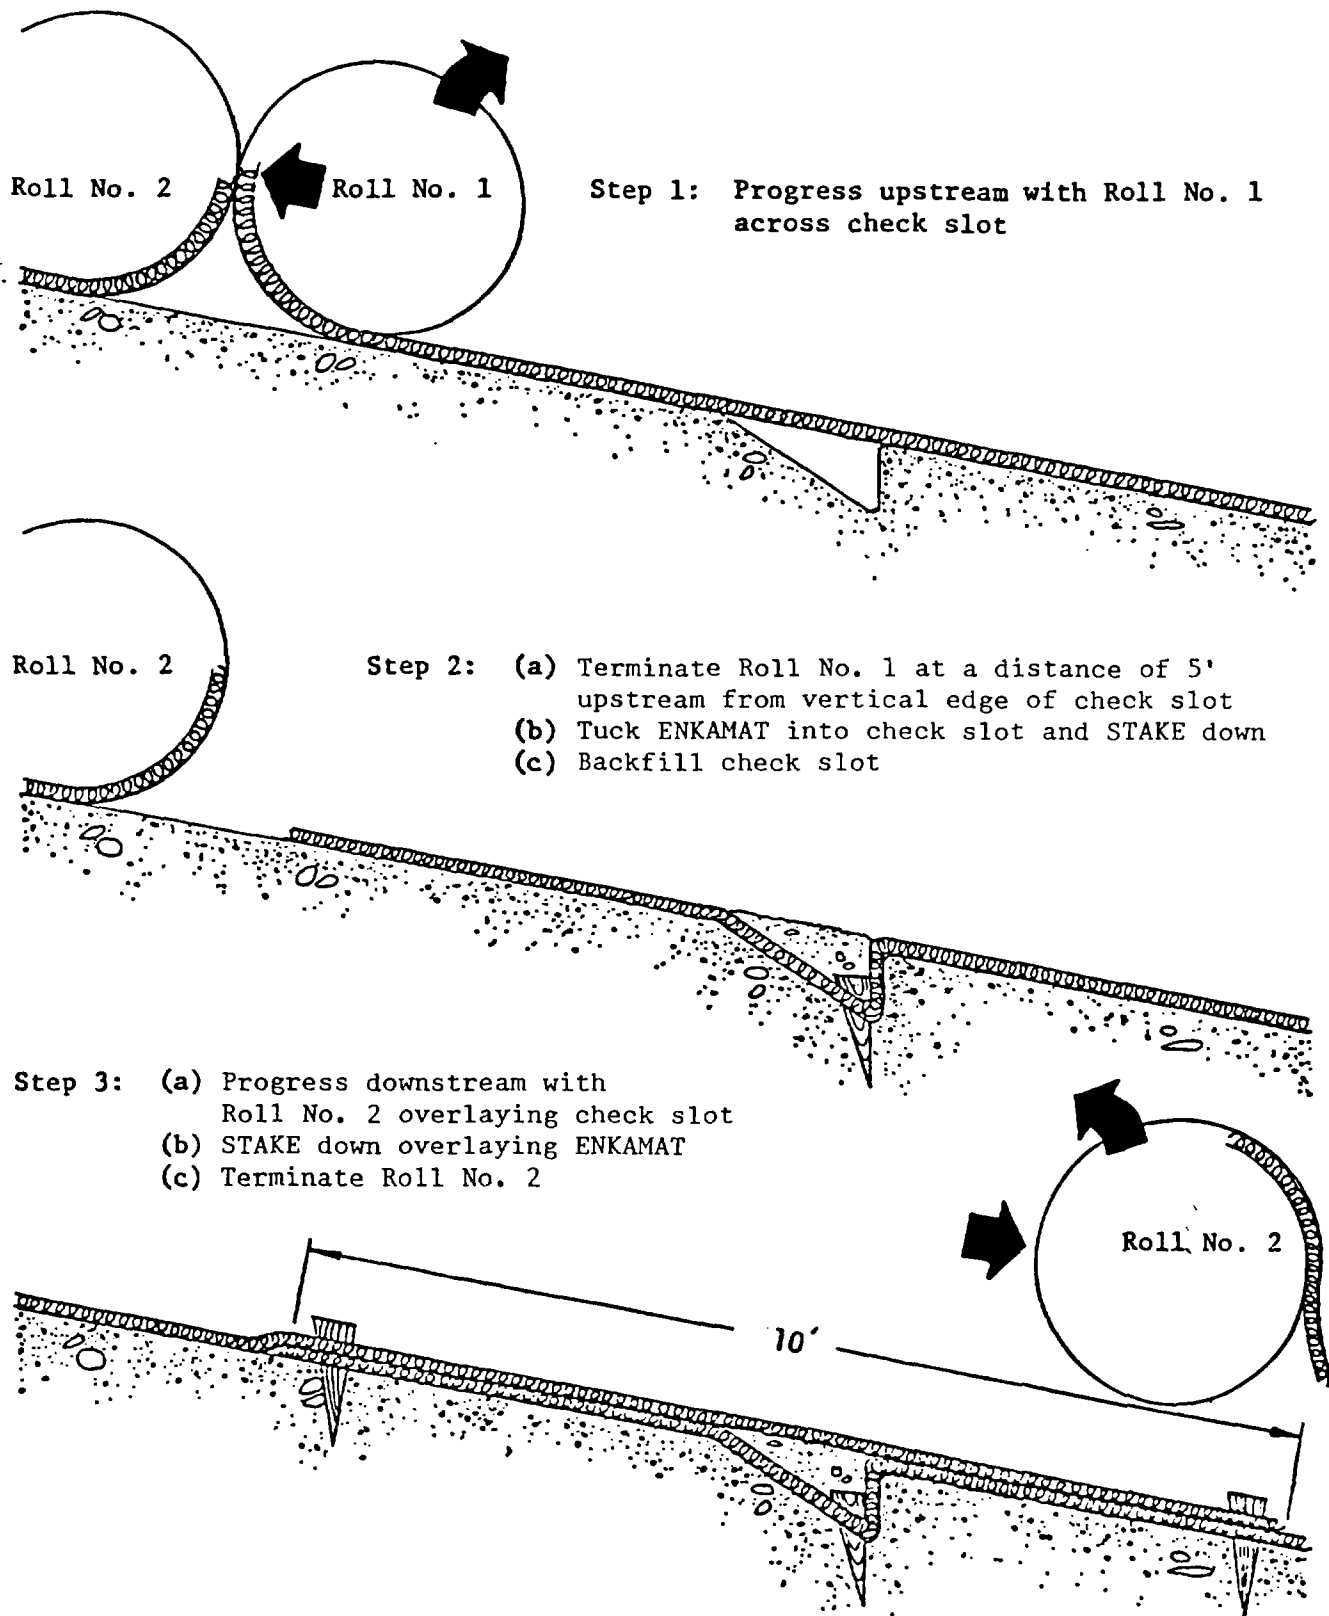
A - INSTALLING ENKAMAT® - REINFORCED CONSTRUCTION
